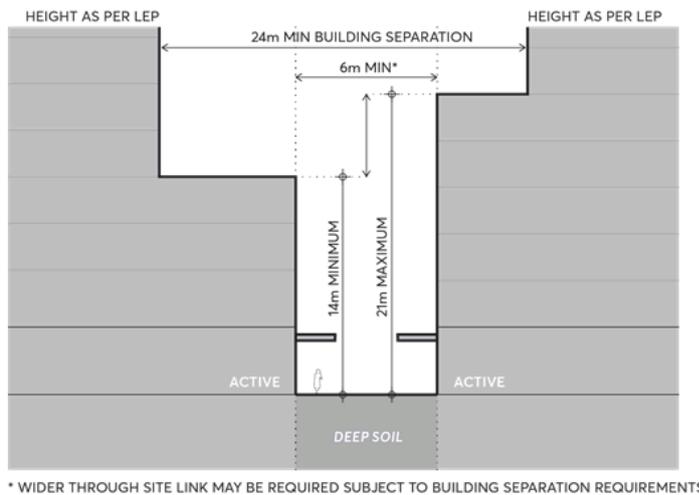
East West (Section H) Through Site Link Setbacks and Street Wall Height
